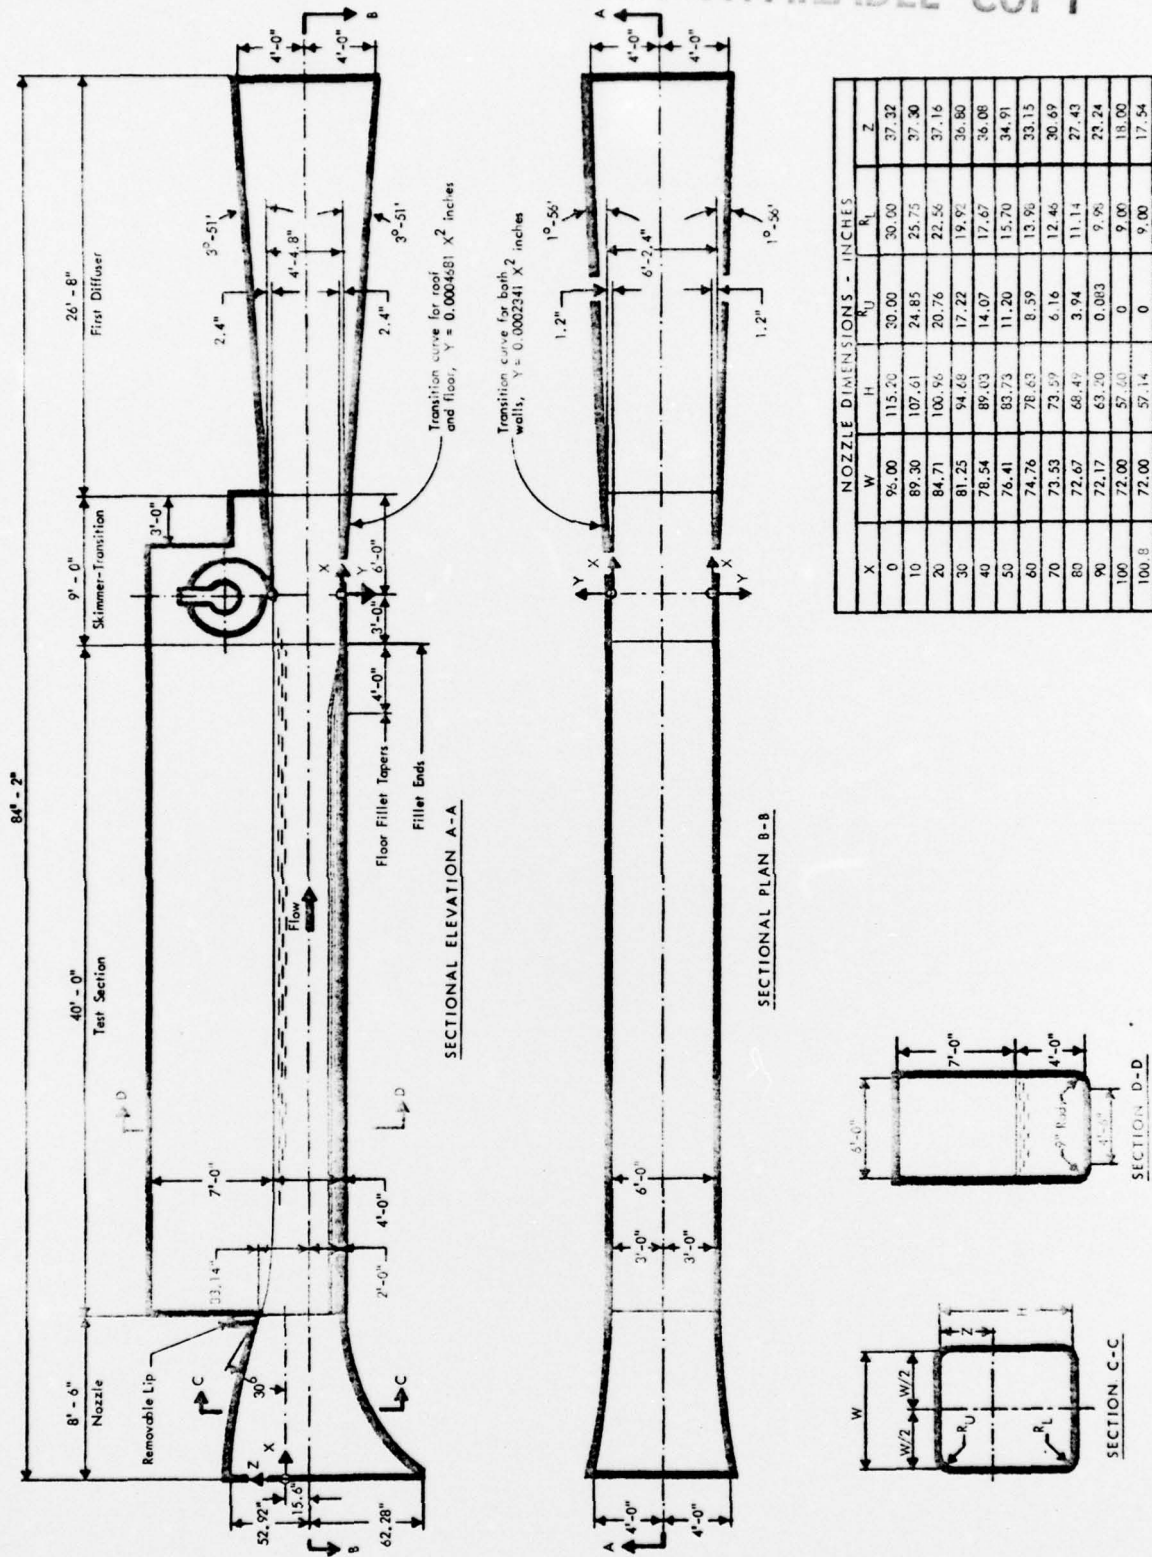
The Alternate or Large Test Section Configuration (all dimensions relate to prototype inside flow surfaces)
